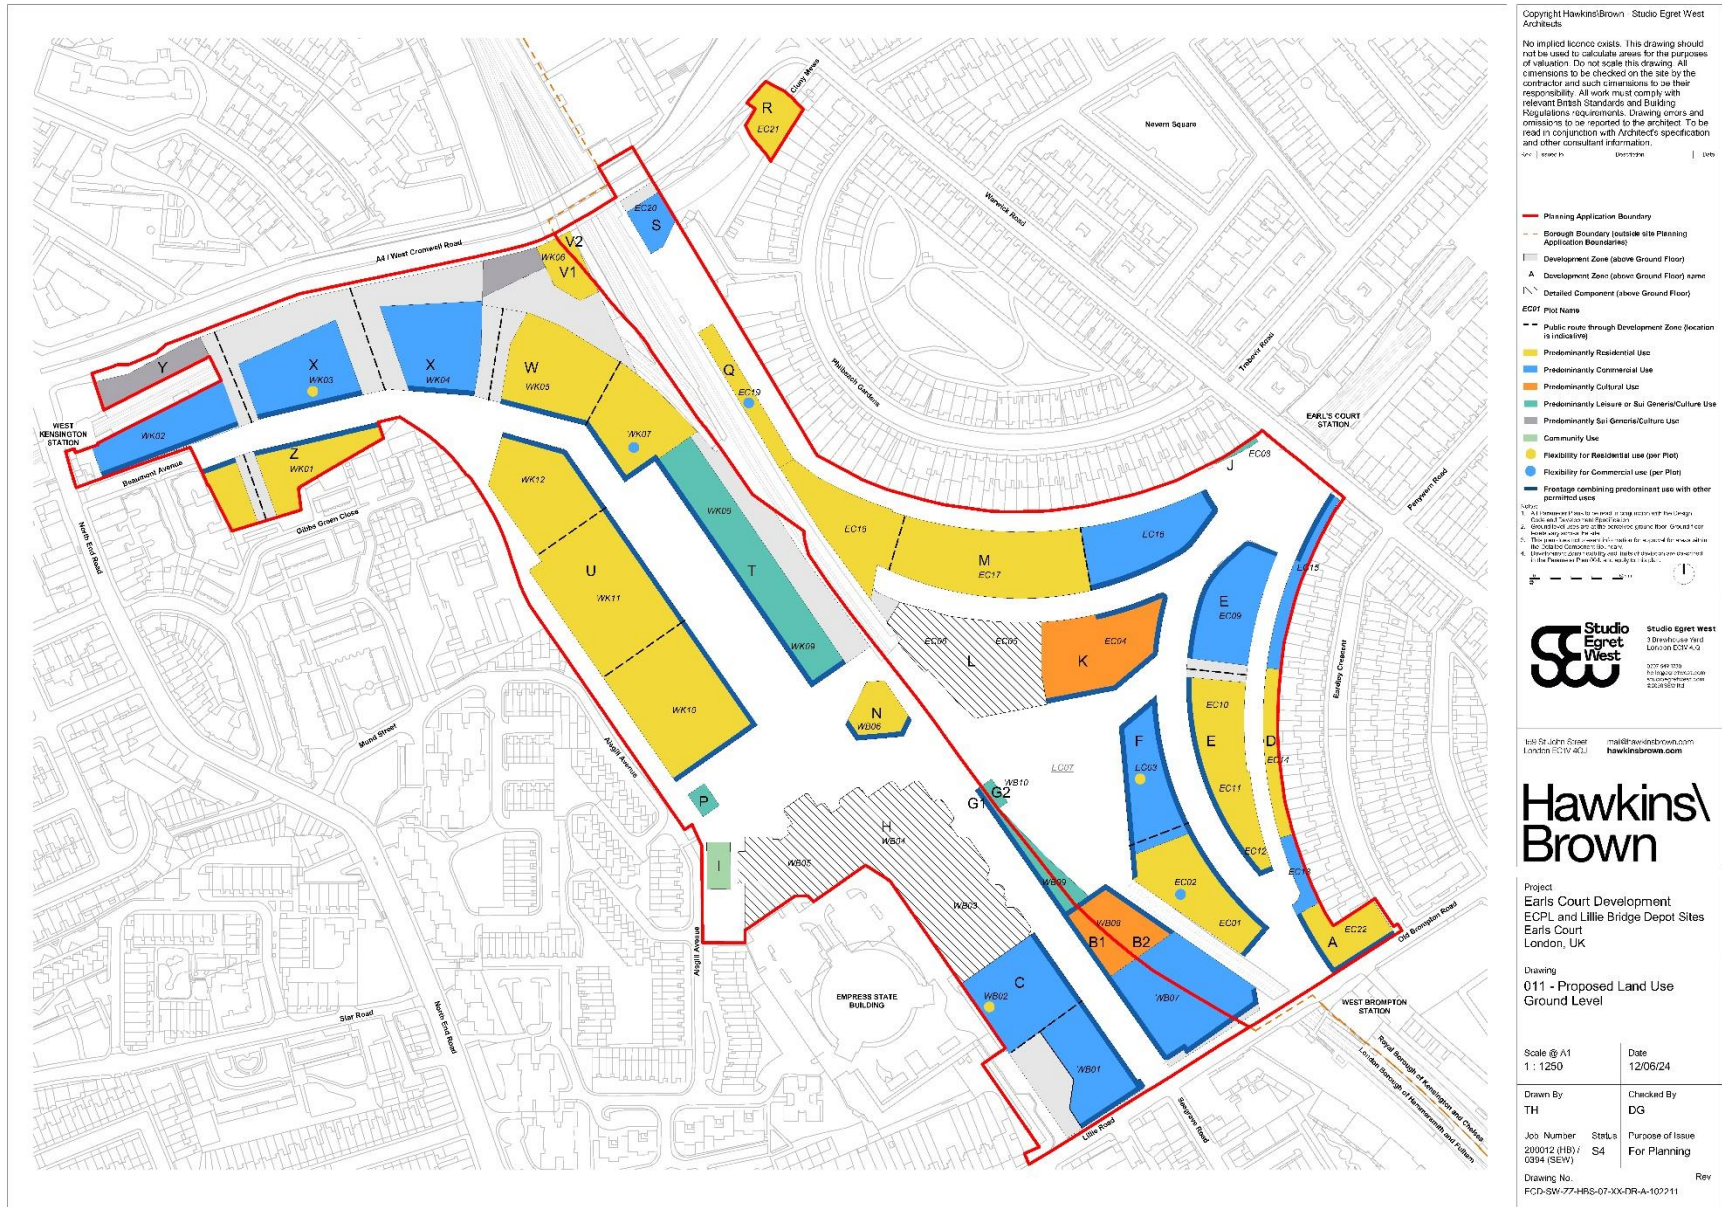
Proposed Land Use Ground Level Parameter Plan
